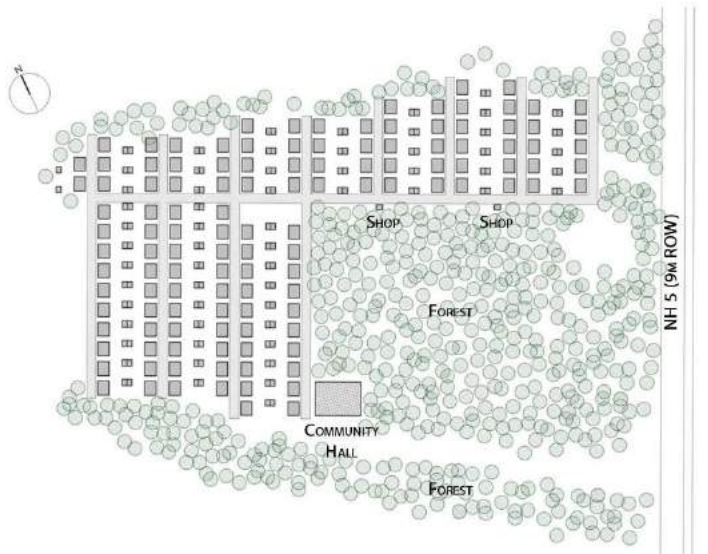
Site plan of Keshpur, ODRP Housing (Source: Author)
